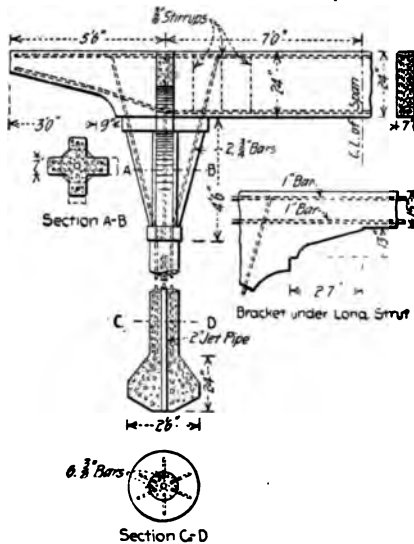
Details of 12-in. Reinforced Concrete Pile, Atlantic City Steel Pier.
